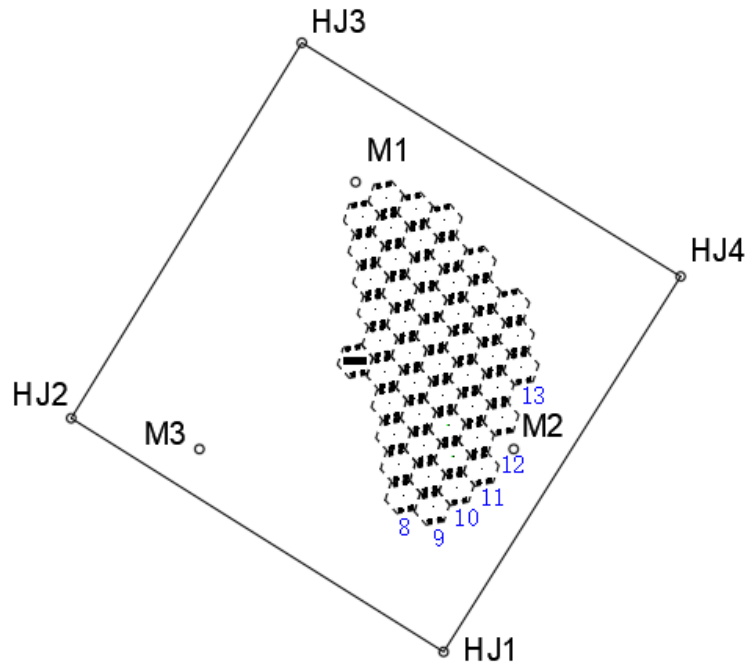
Place Bottom Pieces of Mounting Bases in Area A
